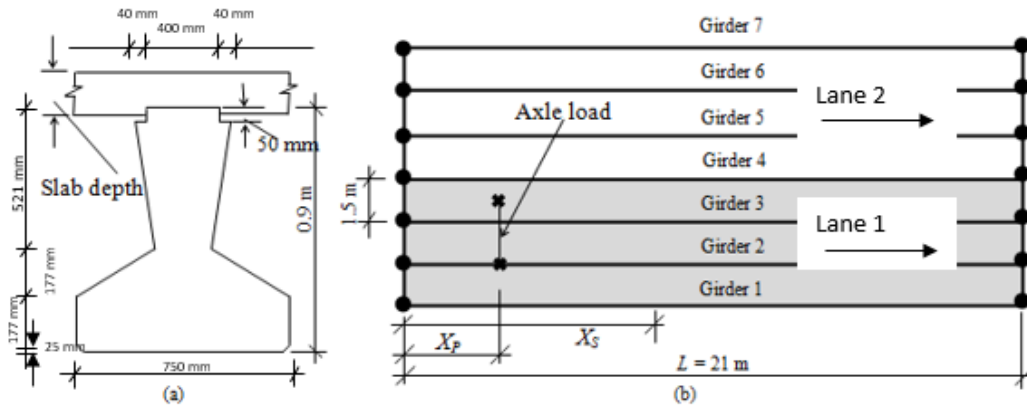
Schematic of Beam-and-Slab Bridge: (a) Y-beam Cross Section (dimensions in mm), (b) Plan view
